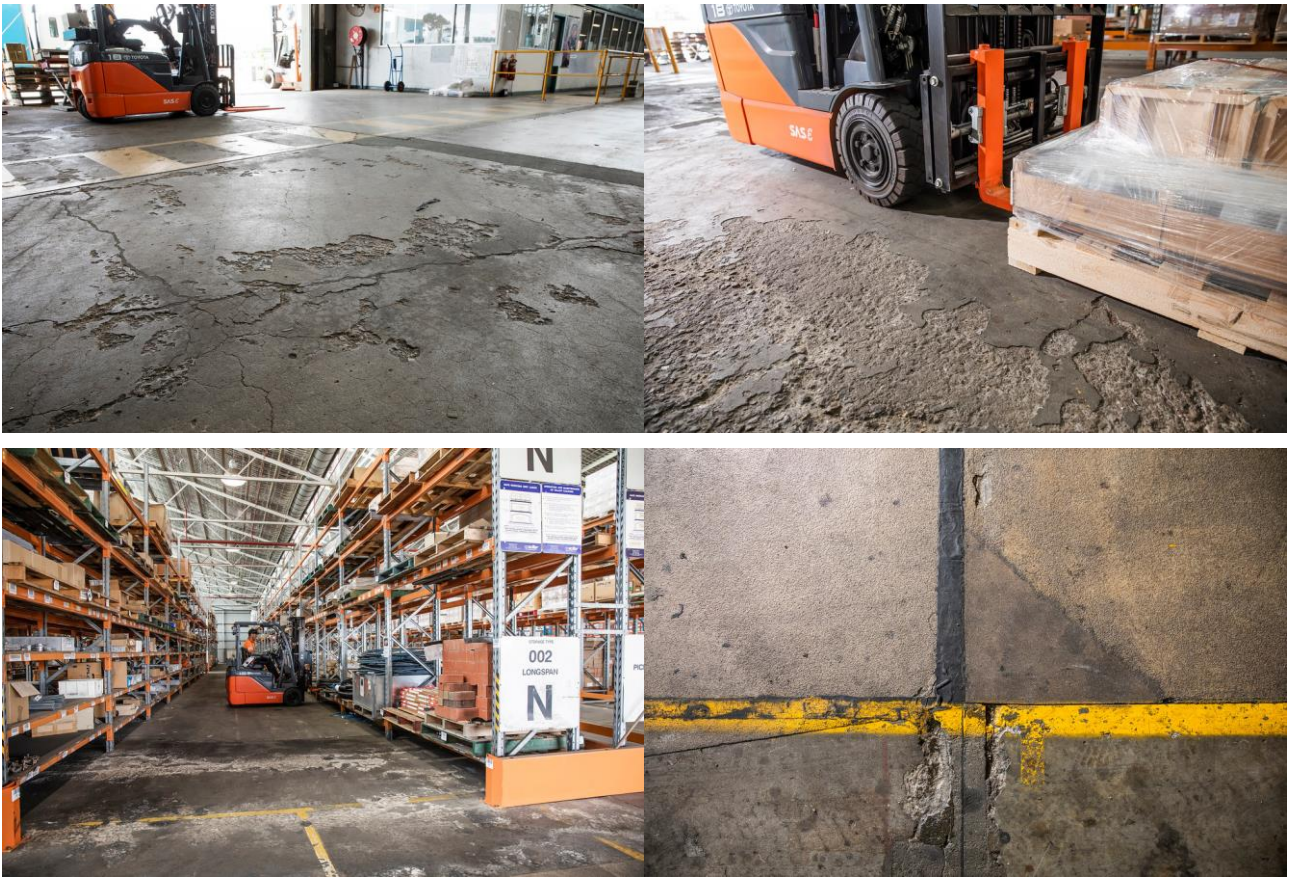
Example concrete cracking and de-lamination to large areas of the logistics warehouse floor.
